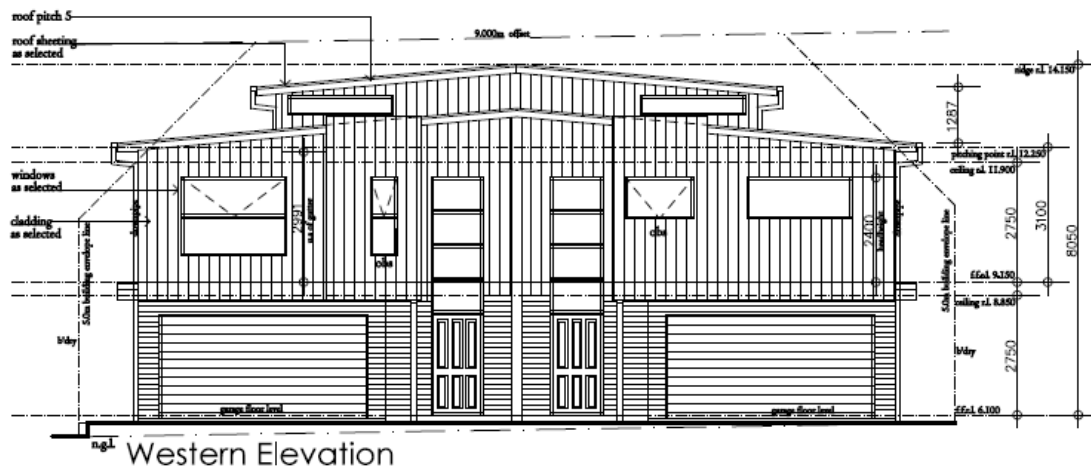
Elevation Plan of Units 3 and 4 (from internal driveway)
